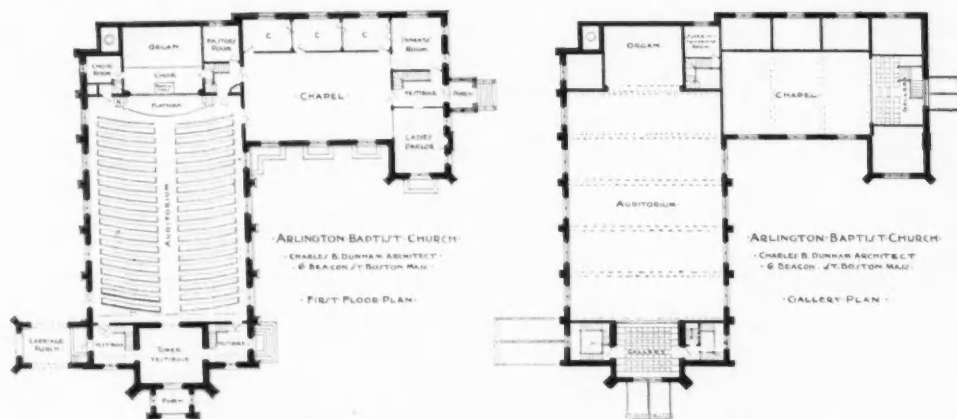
ARLINGTON BAPTIST CHURCH, ARLINGTON, MASS. RECTANGULAR AUDIENCE HALL PLAN, PULPIT ACROSS SHORT END, TRADITIONAL SUGGESTION.
